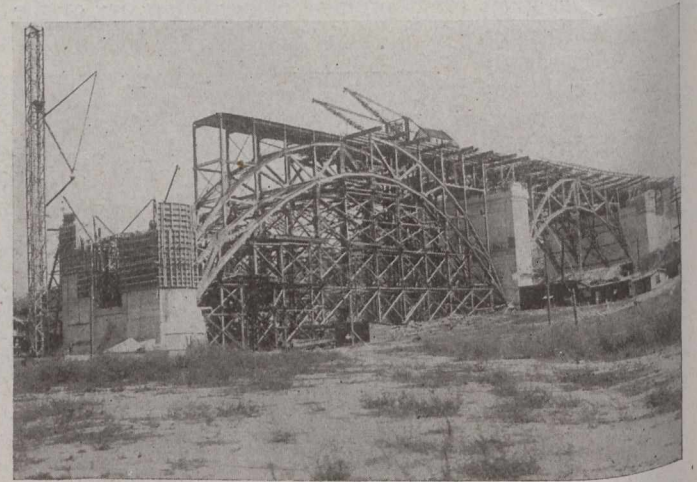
Don Section, Construction View of 240-ft. Arch on Falsework, Connecting Piers B and C. The 158-ft. Arch Connecting Piers A and B is Completed.
